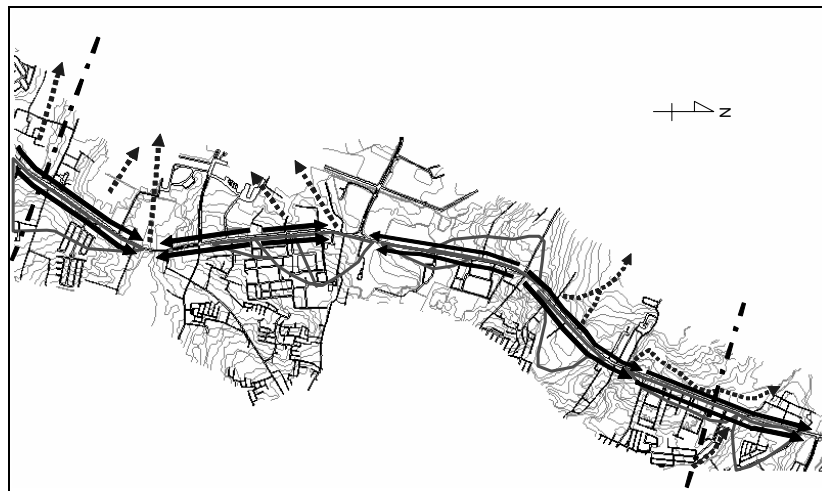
Existing Drainage Network of Section A (3/4)
